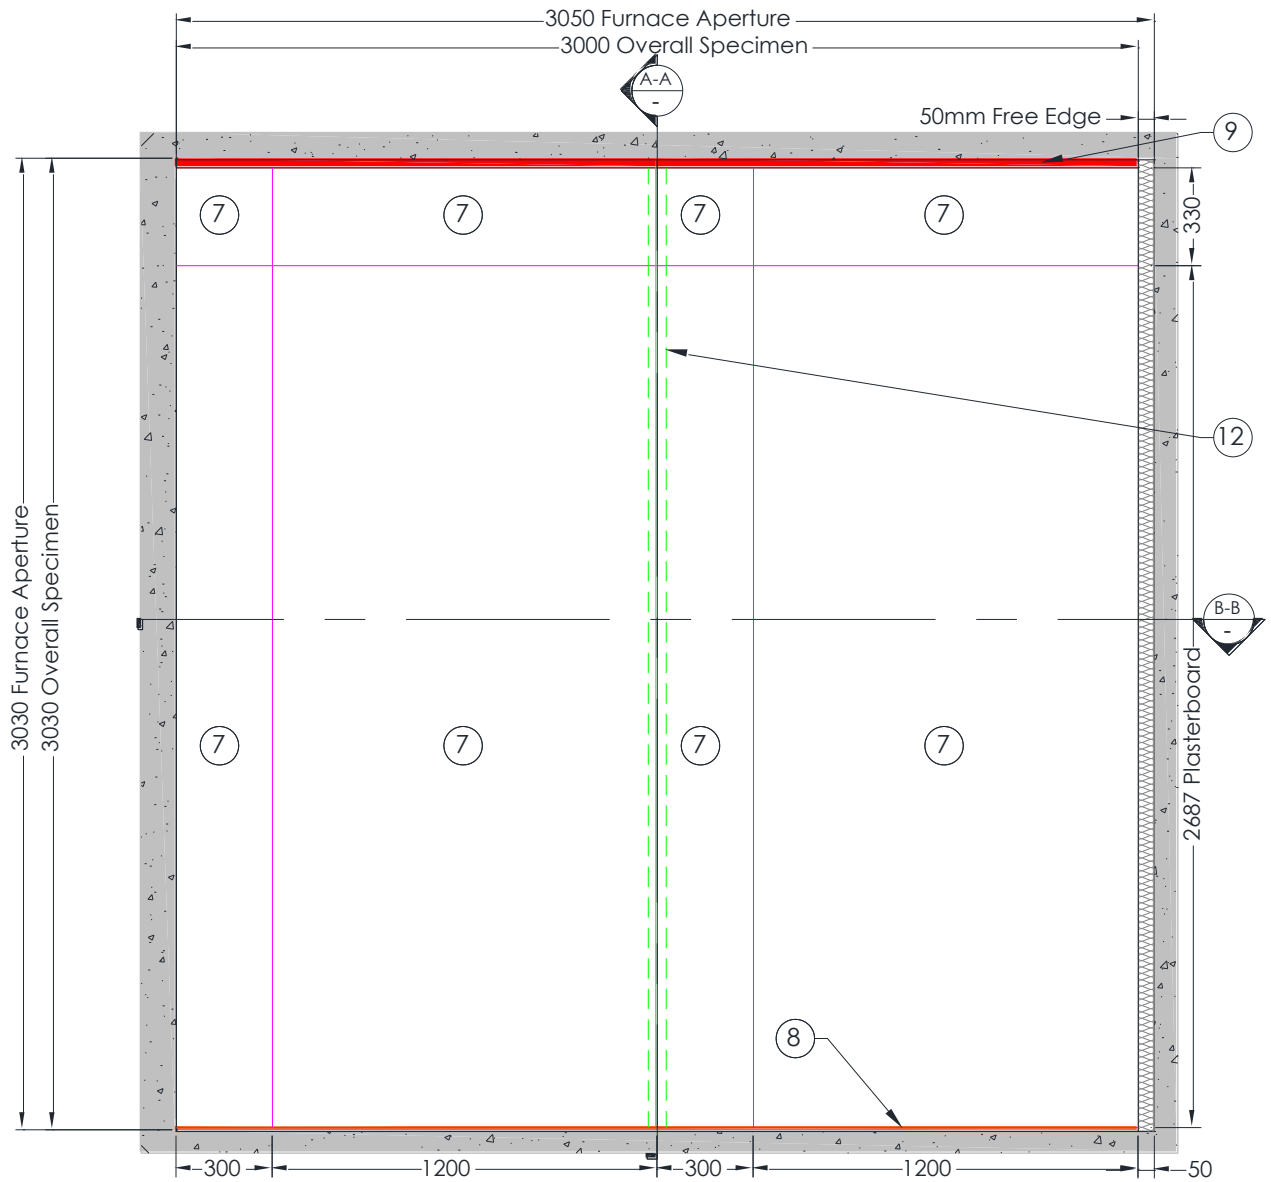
General Section Through Specimen Showing Framework – Unexposed Face
